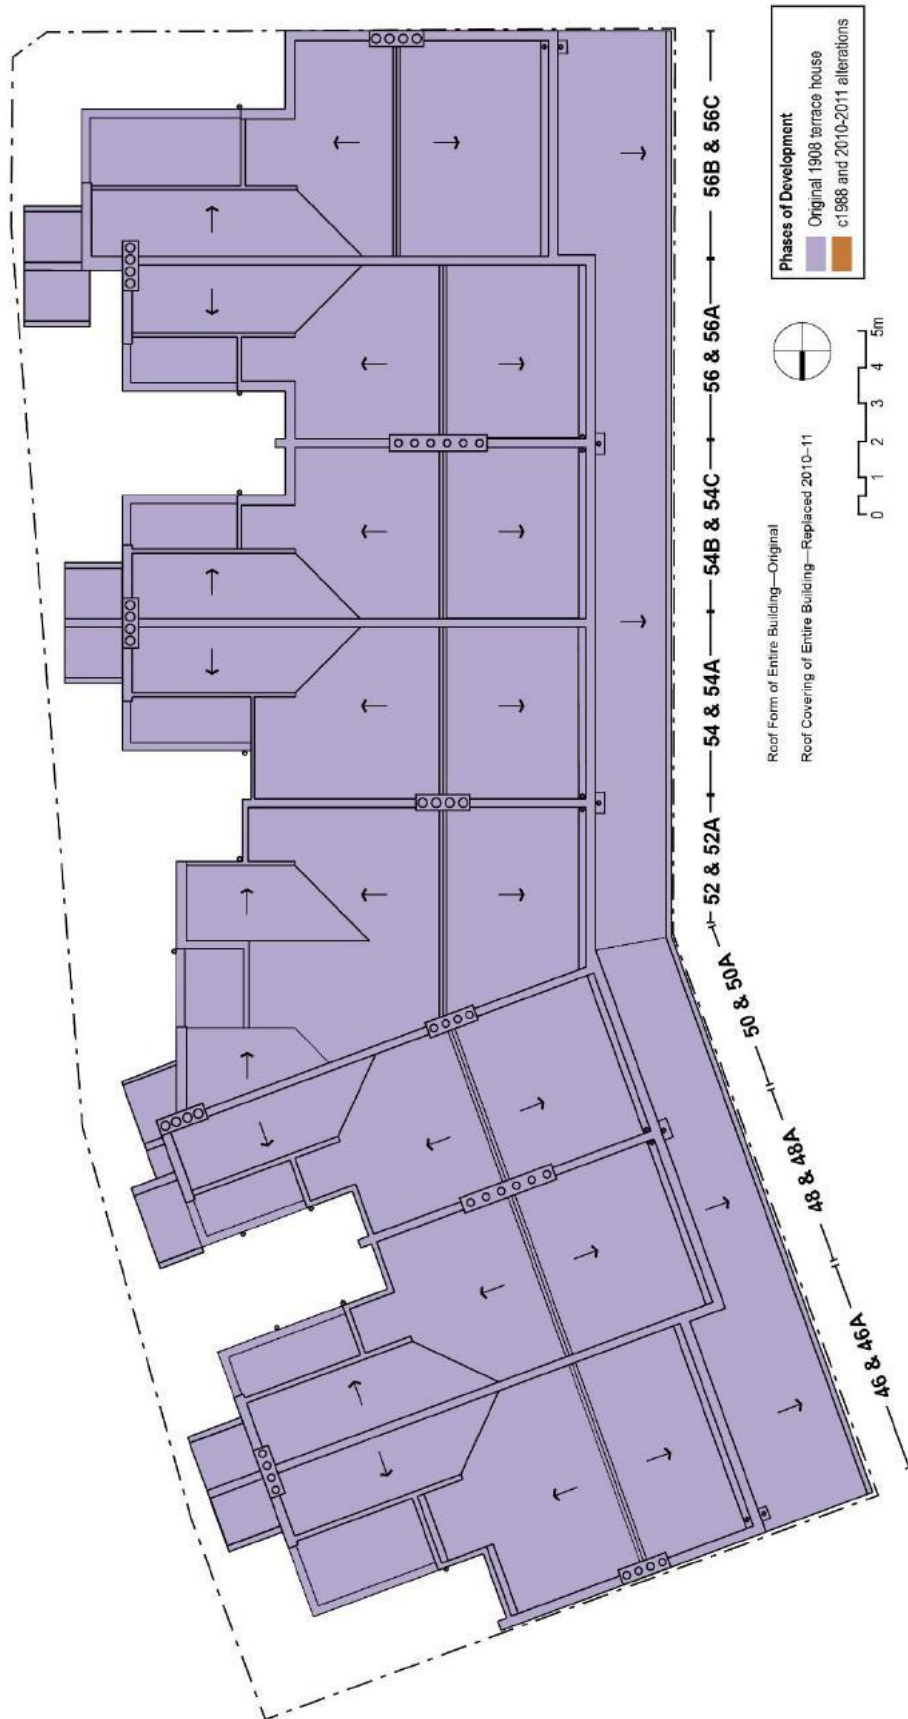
Diagram showing periods of construction—roof plan. (Source: LAHC, with GML overlay 2016)
